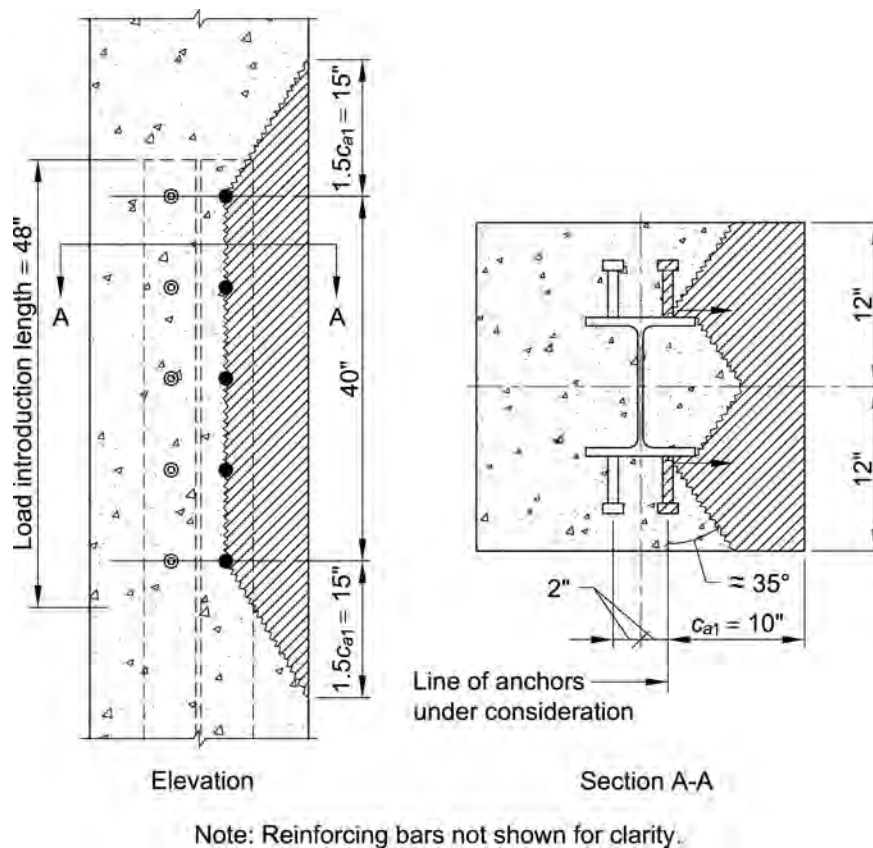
Concrete breakout check for shear force parallel to an edge.
